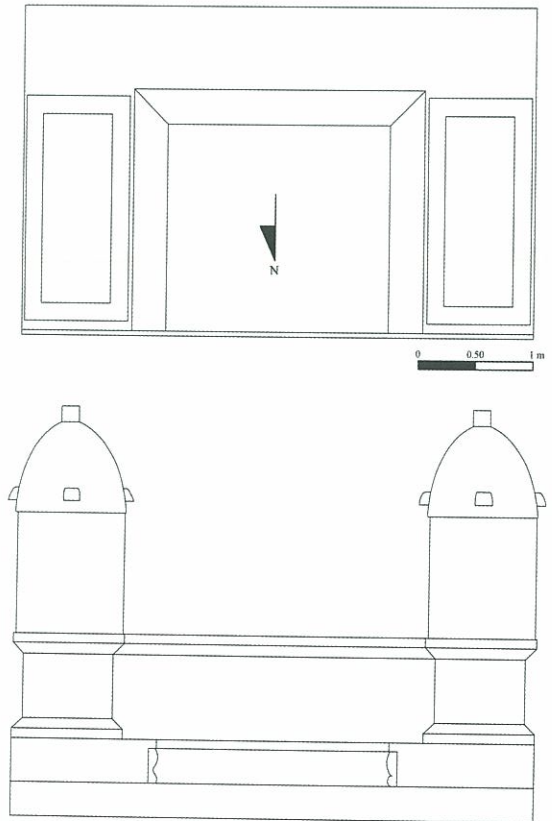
Idebessos, tomb with exedra 4, plan, facade elevation.
